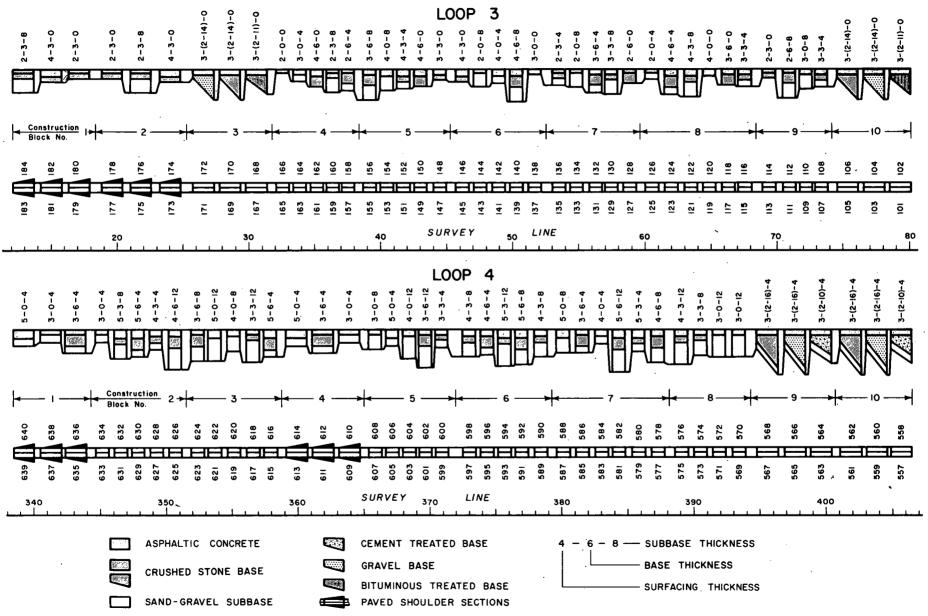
Layout of flexible tangent, Loops 3 and 4.
